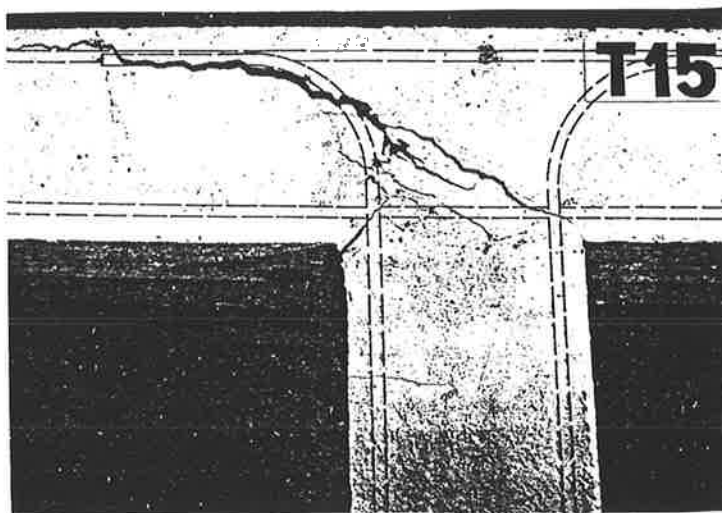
Post failure condition of T15 tested by Nilsson (1973)
